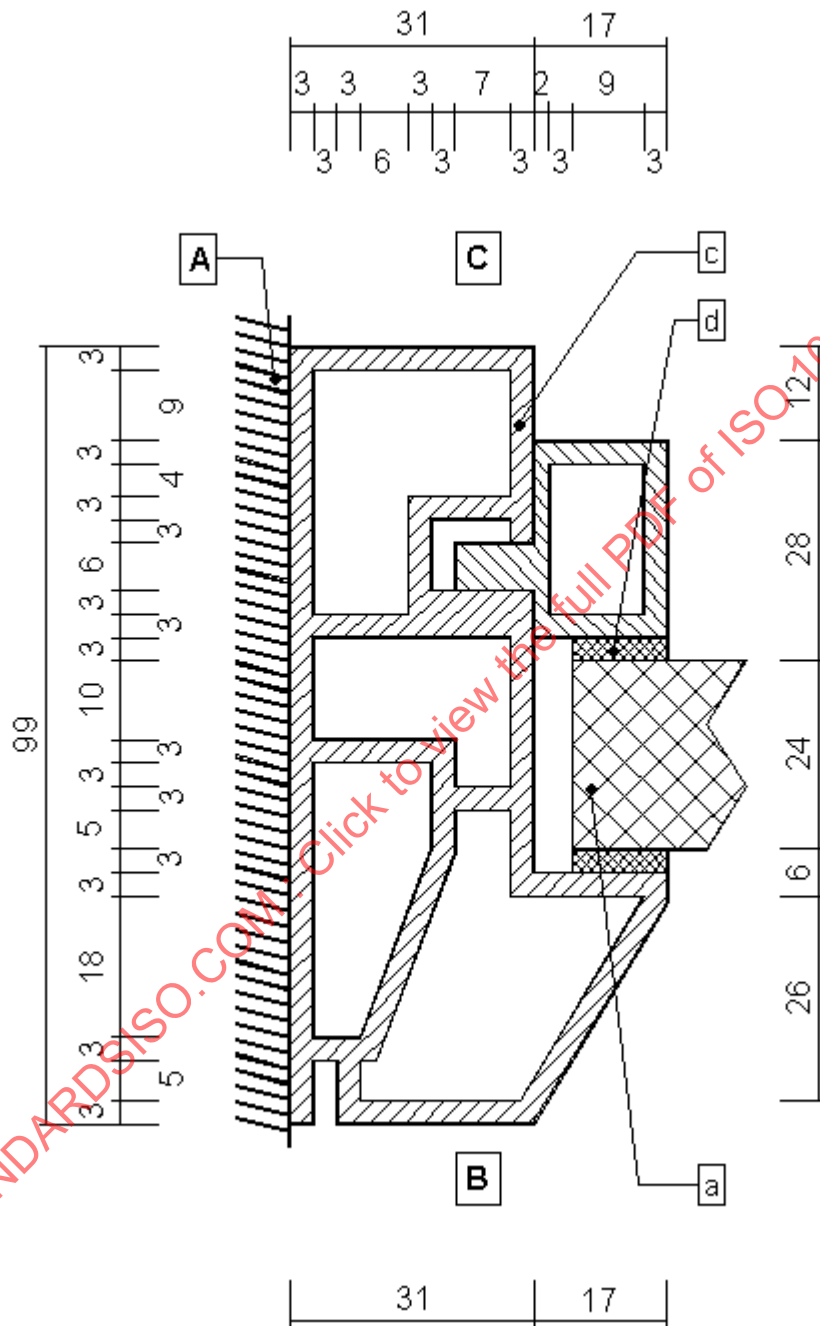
Fixed frame section and insulation panel ($b_f = 48$ mm)
